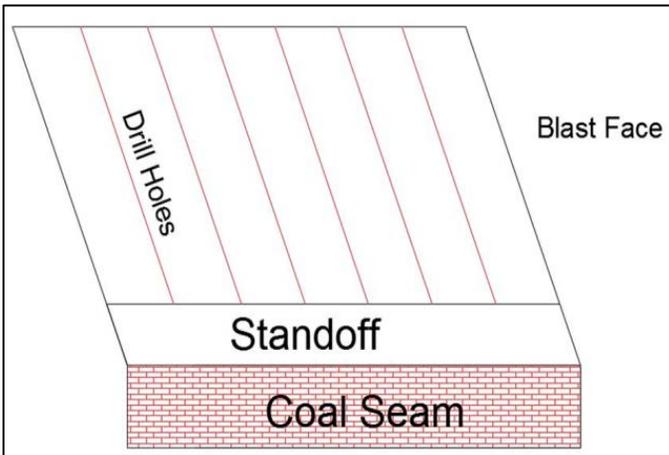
A cross-sectional concept drawing of how a traditional cast blast is drilled.
